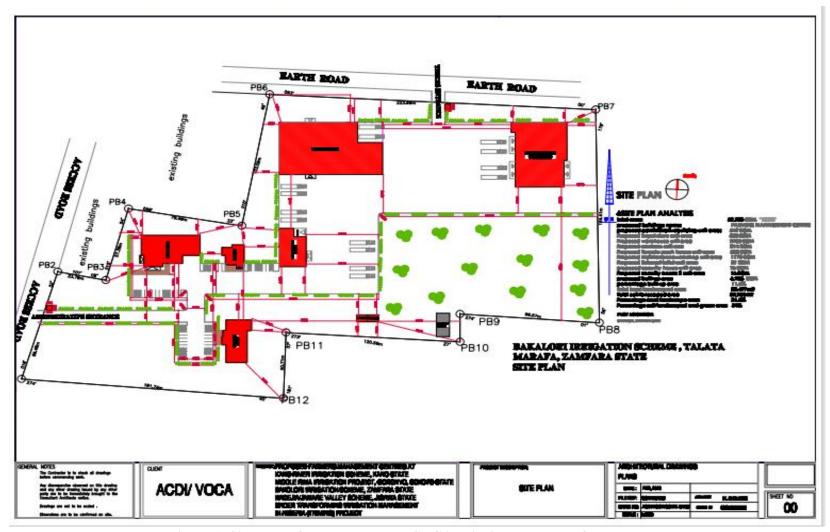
Site Plan of the proposed FMSDC in Birnin Tudu, Zamfara state
